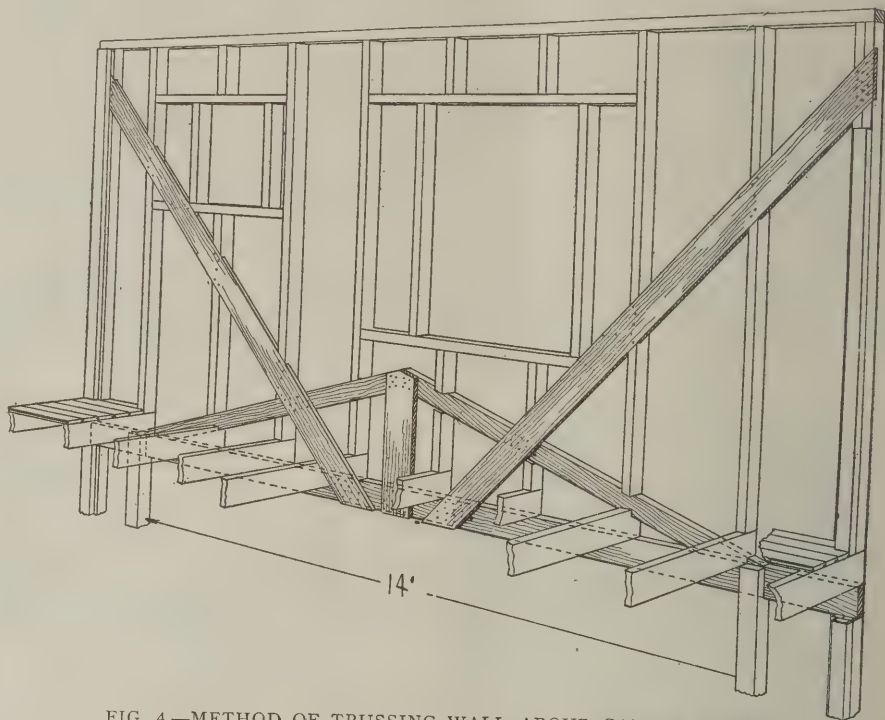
METHOD OF TRUSSING WALL ABOVE GARAGE DOORS
